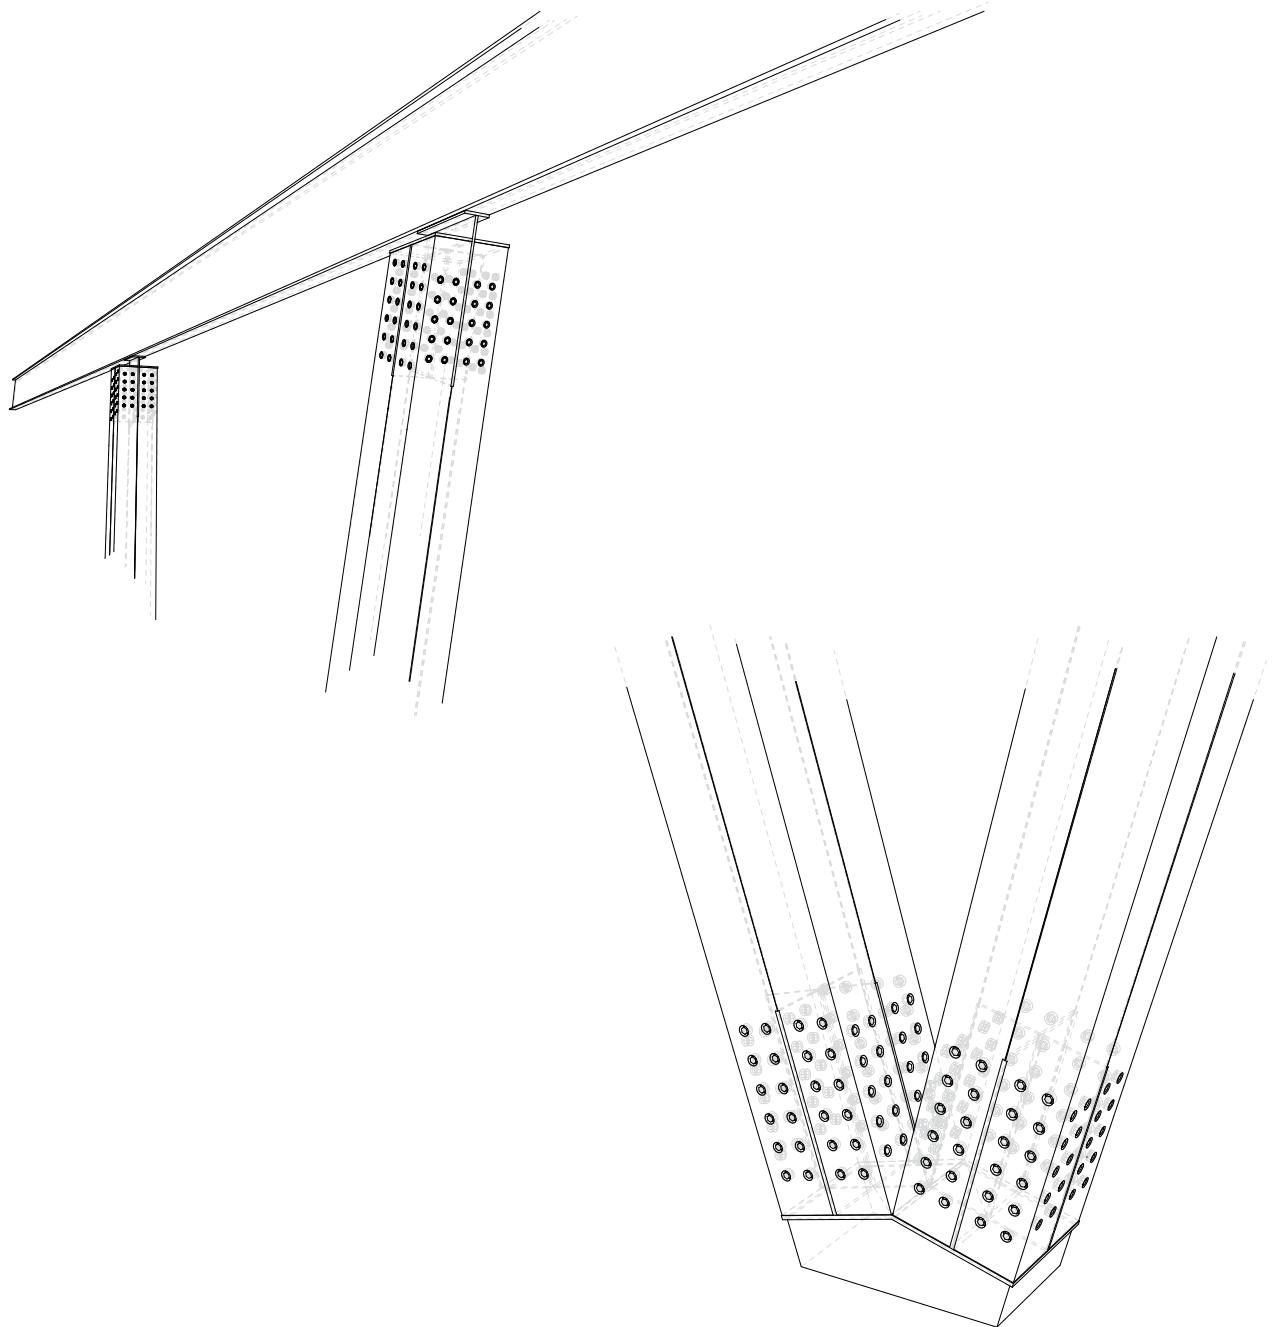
Isometric drawings of structural joints in top and base of the freestanding columns
